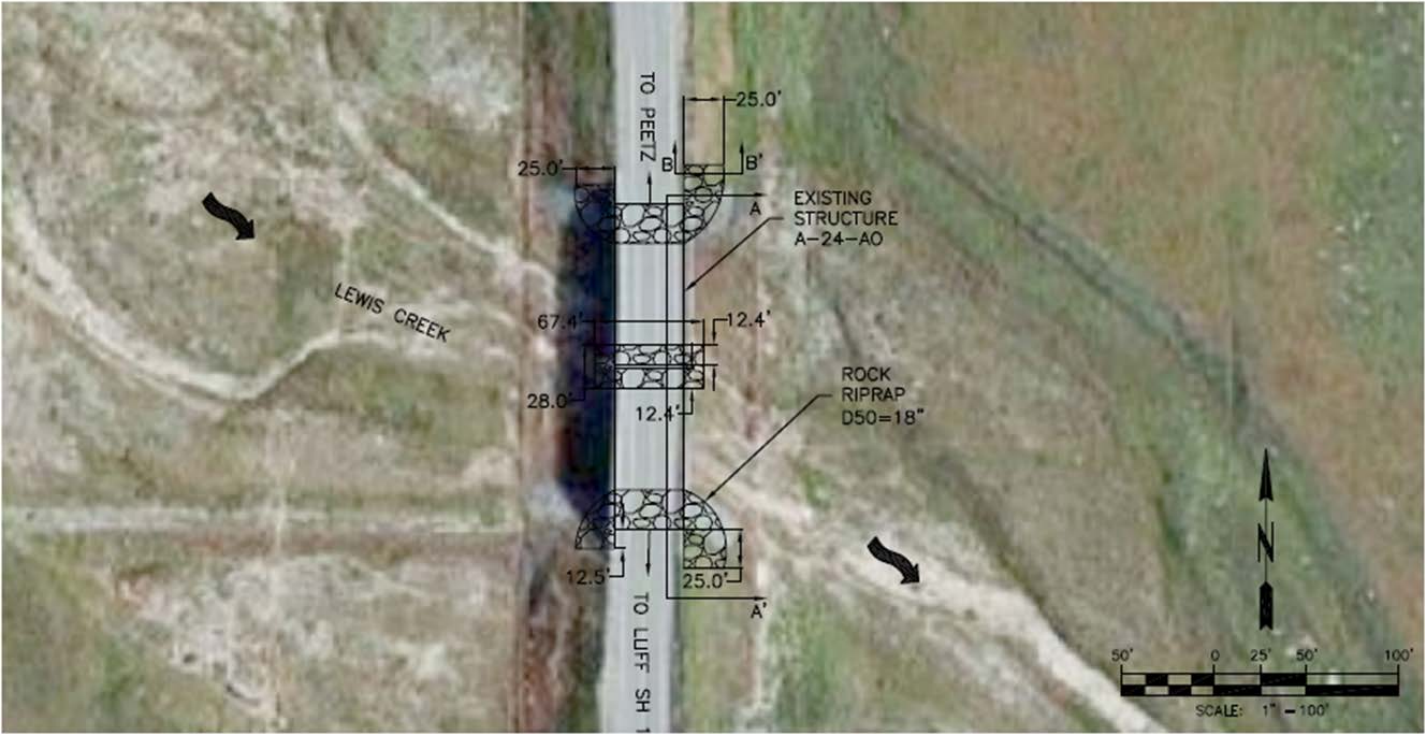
Plan view of Bridge A-24-AO with recommended hydraulic scour countermeasure locations
